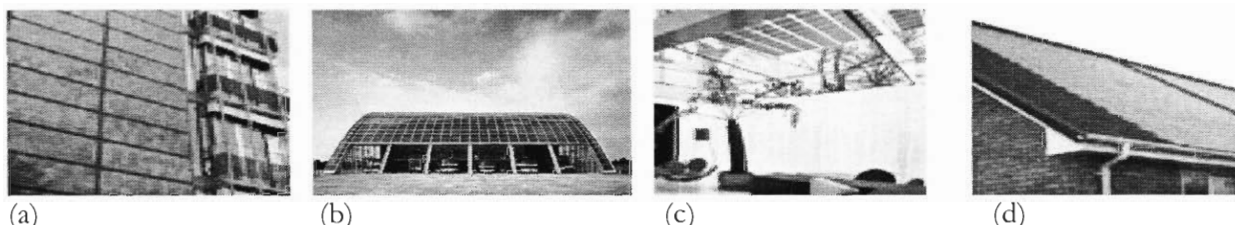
Integrated PV: (a) building façade, (b) glass roof, (c) skylight window, (d) house roof
